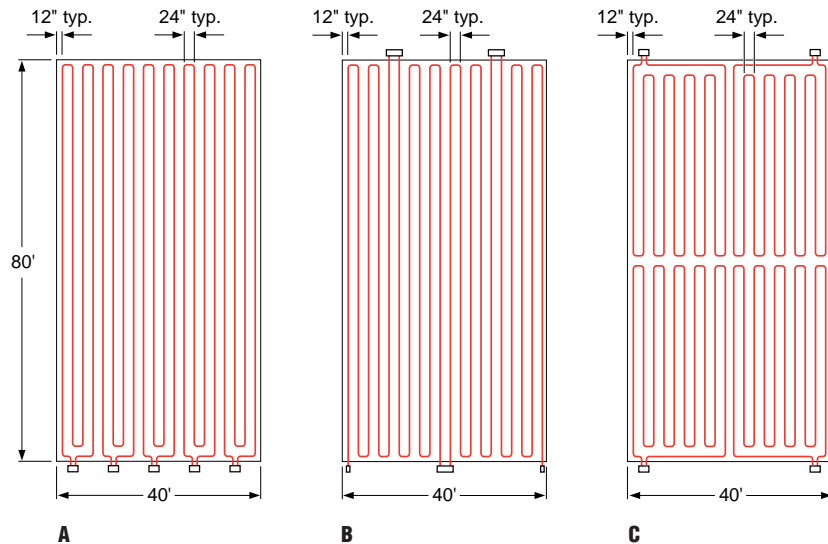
Typical layouts for heating cable attached to the bottom of concrete floors (for typical conduit layout, refer to Figures 5.2 and 5.3 on page 27)
